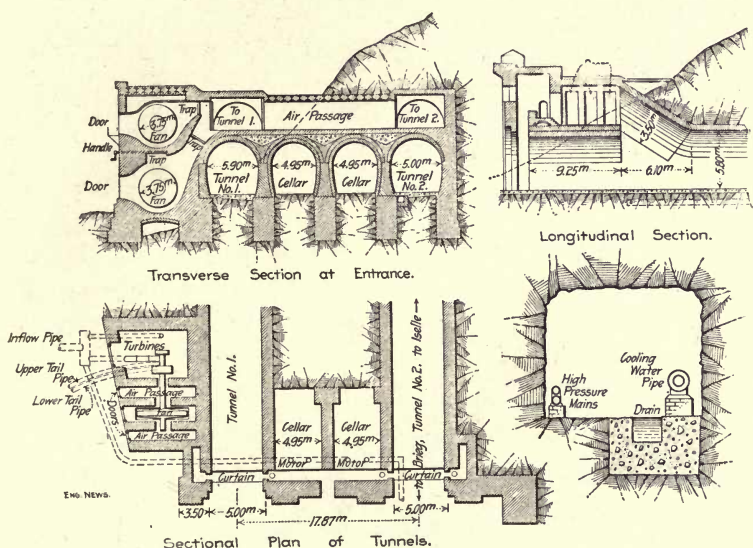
Ventilating Plant at Swiss End of Tunnel, and Section of Tunnel Showing Water-pipes.
